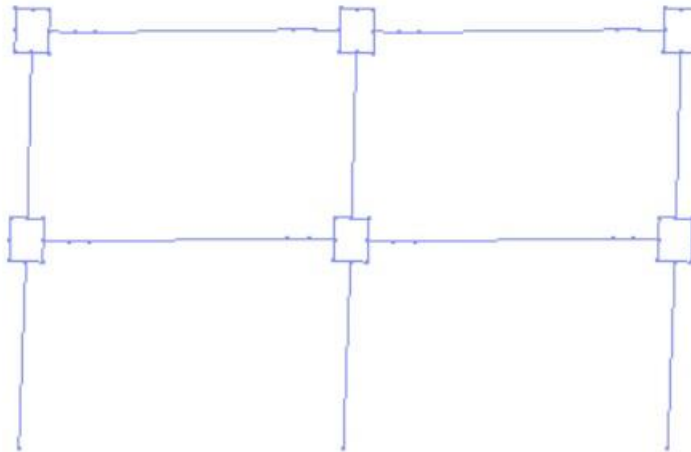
1 An elevation view of the structural layout of a two-story frame
